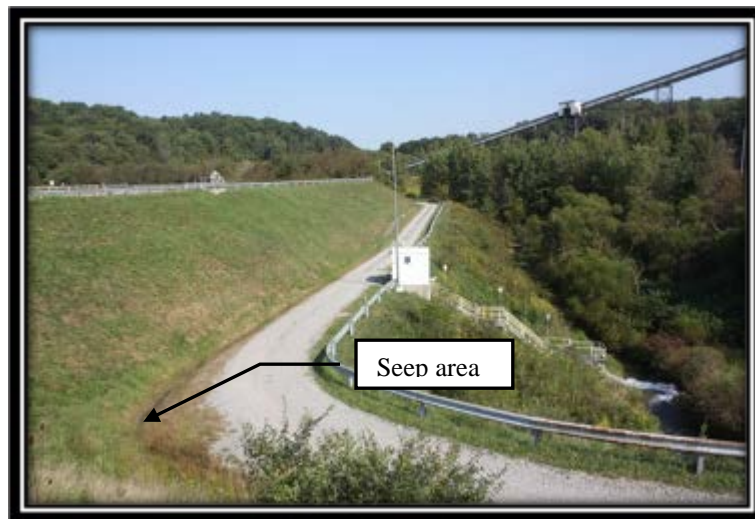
Outside slope and seep area of main embankment dam impounding the Thermal Pond – east side viewed north.
